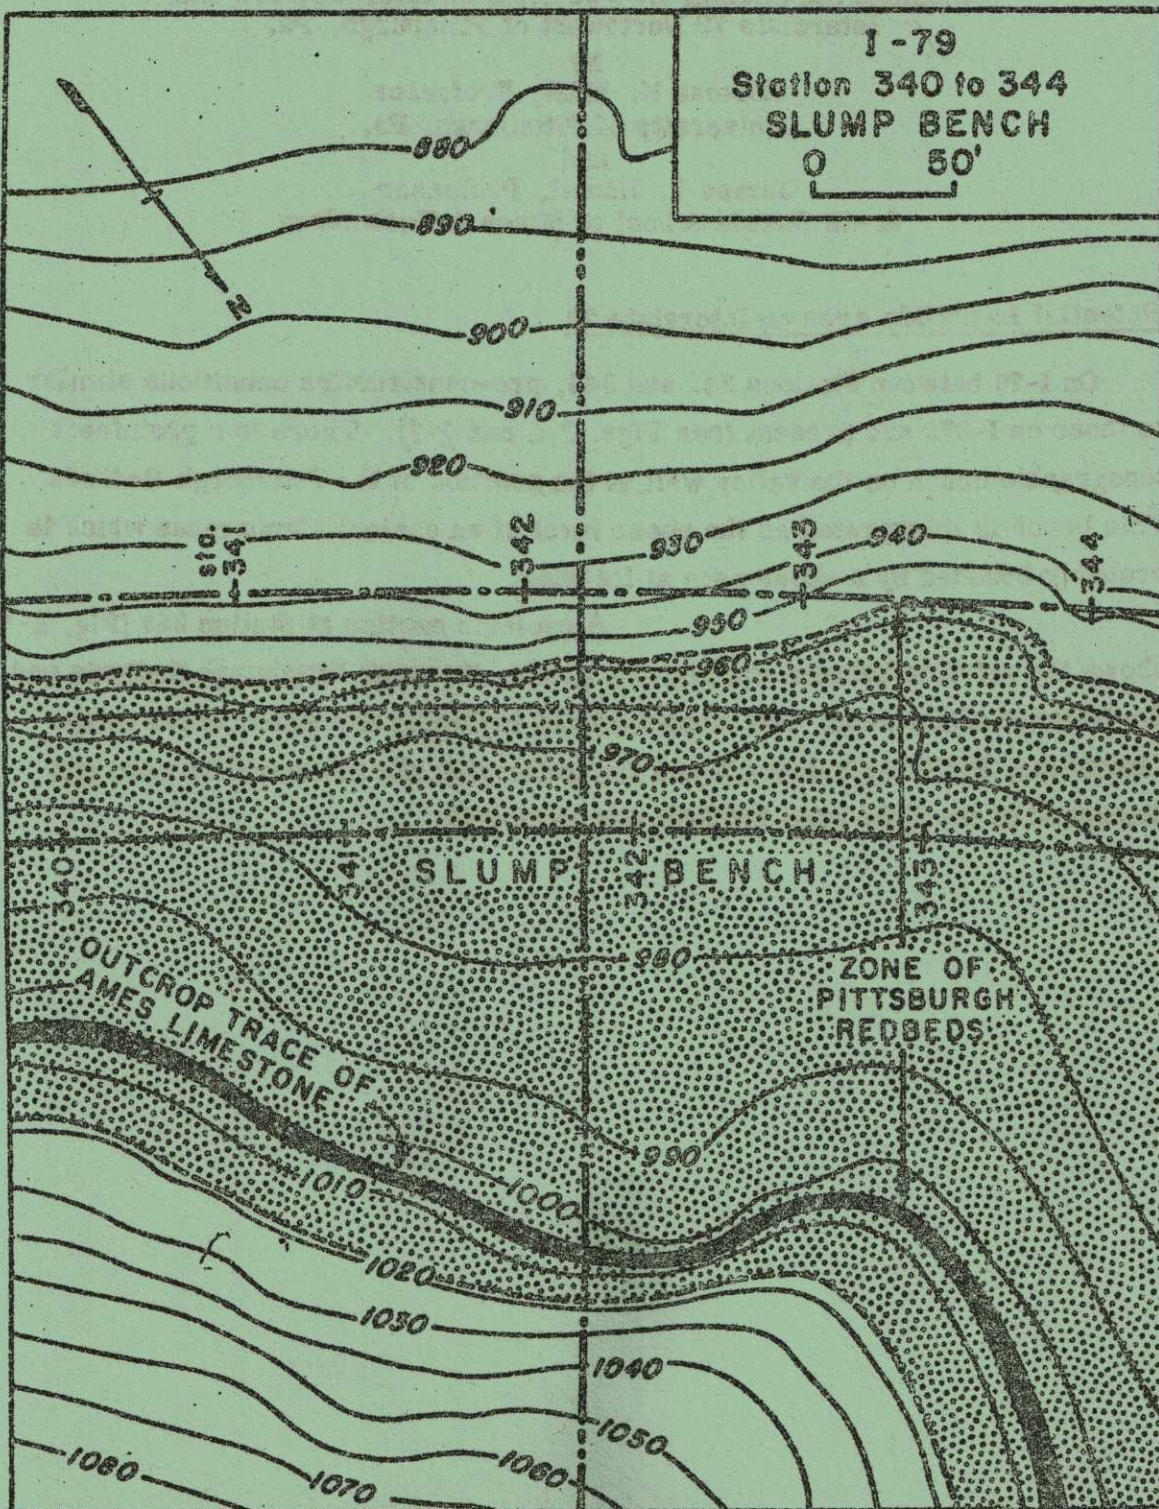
I-79 Station 340 to 344 slump bench
